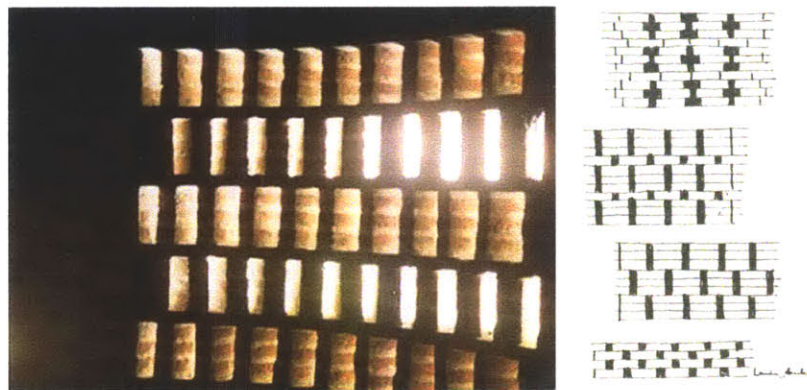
A photo of a brick jali wall and sketches by Laurie Baker
